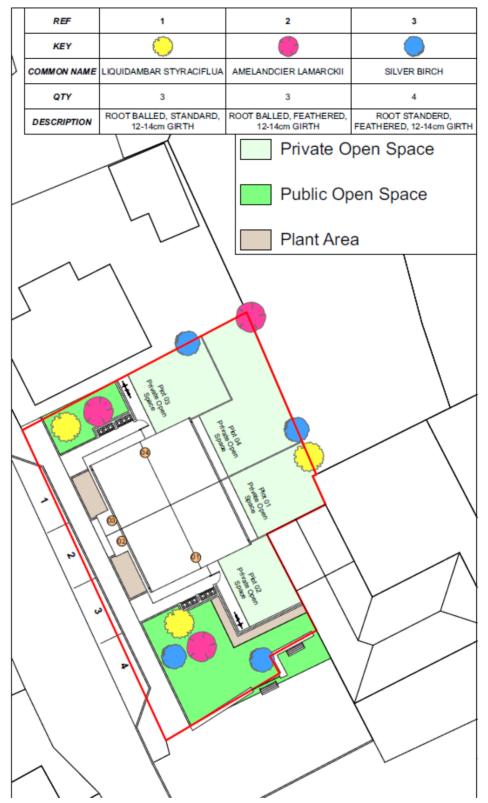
Proposed Landscaping Plan (refer to drawing PL23-002-004 for detail)
